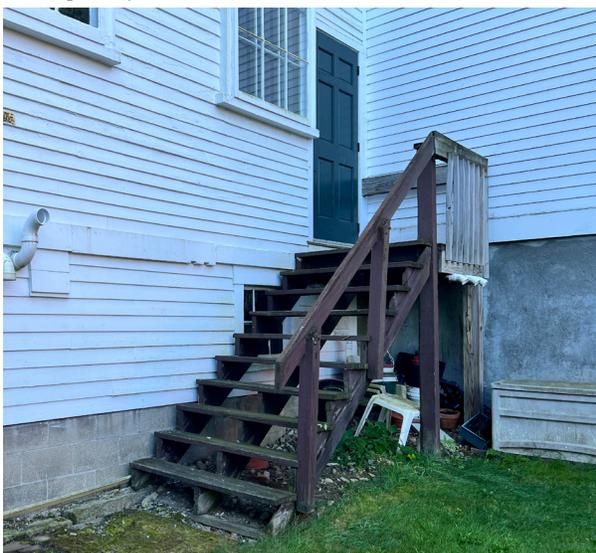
Severely deteriorated wood egress stairs at the north elevation.
